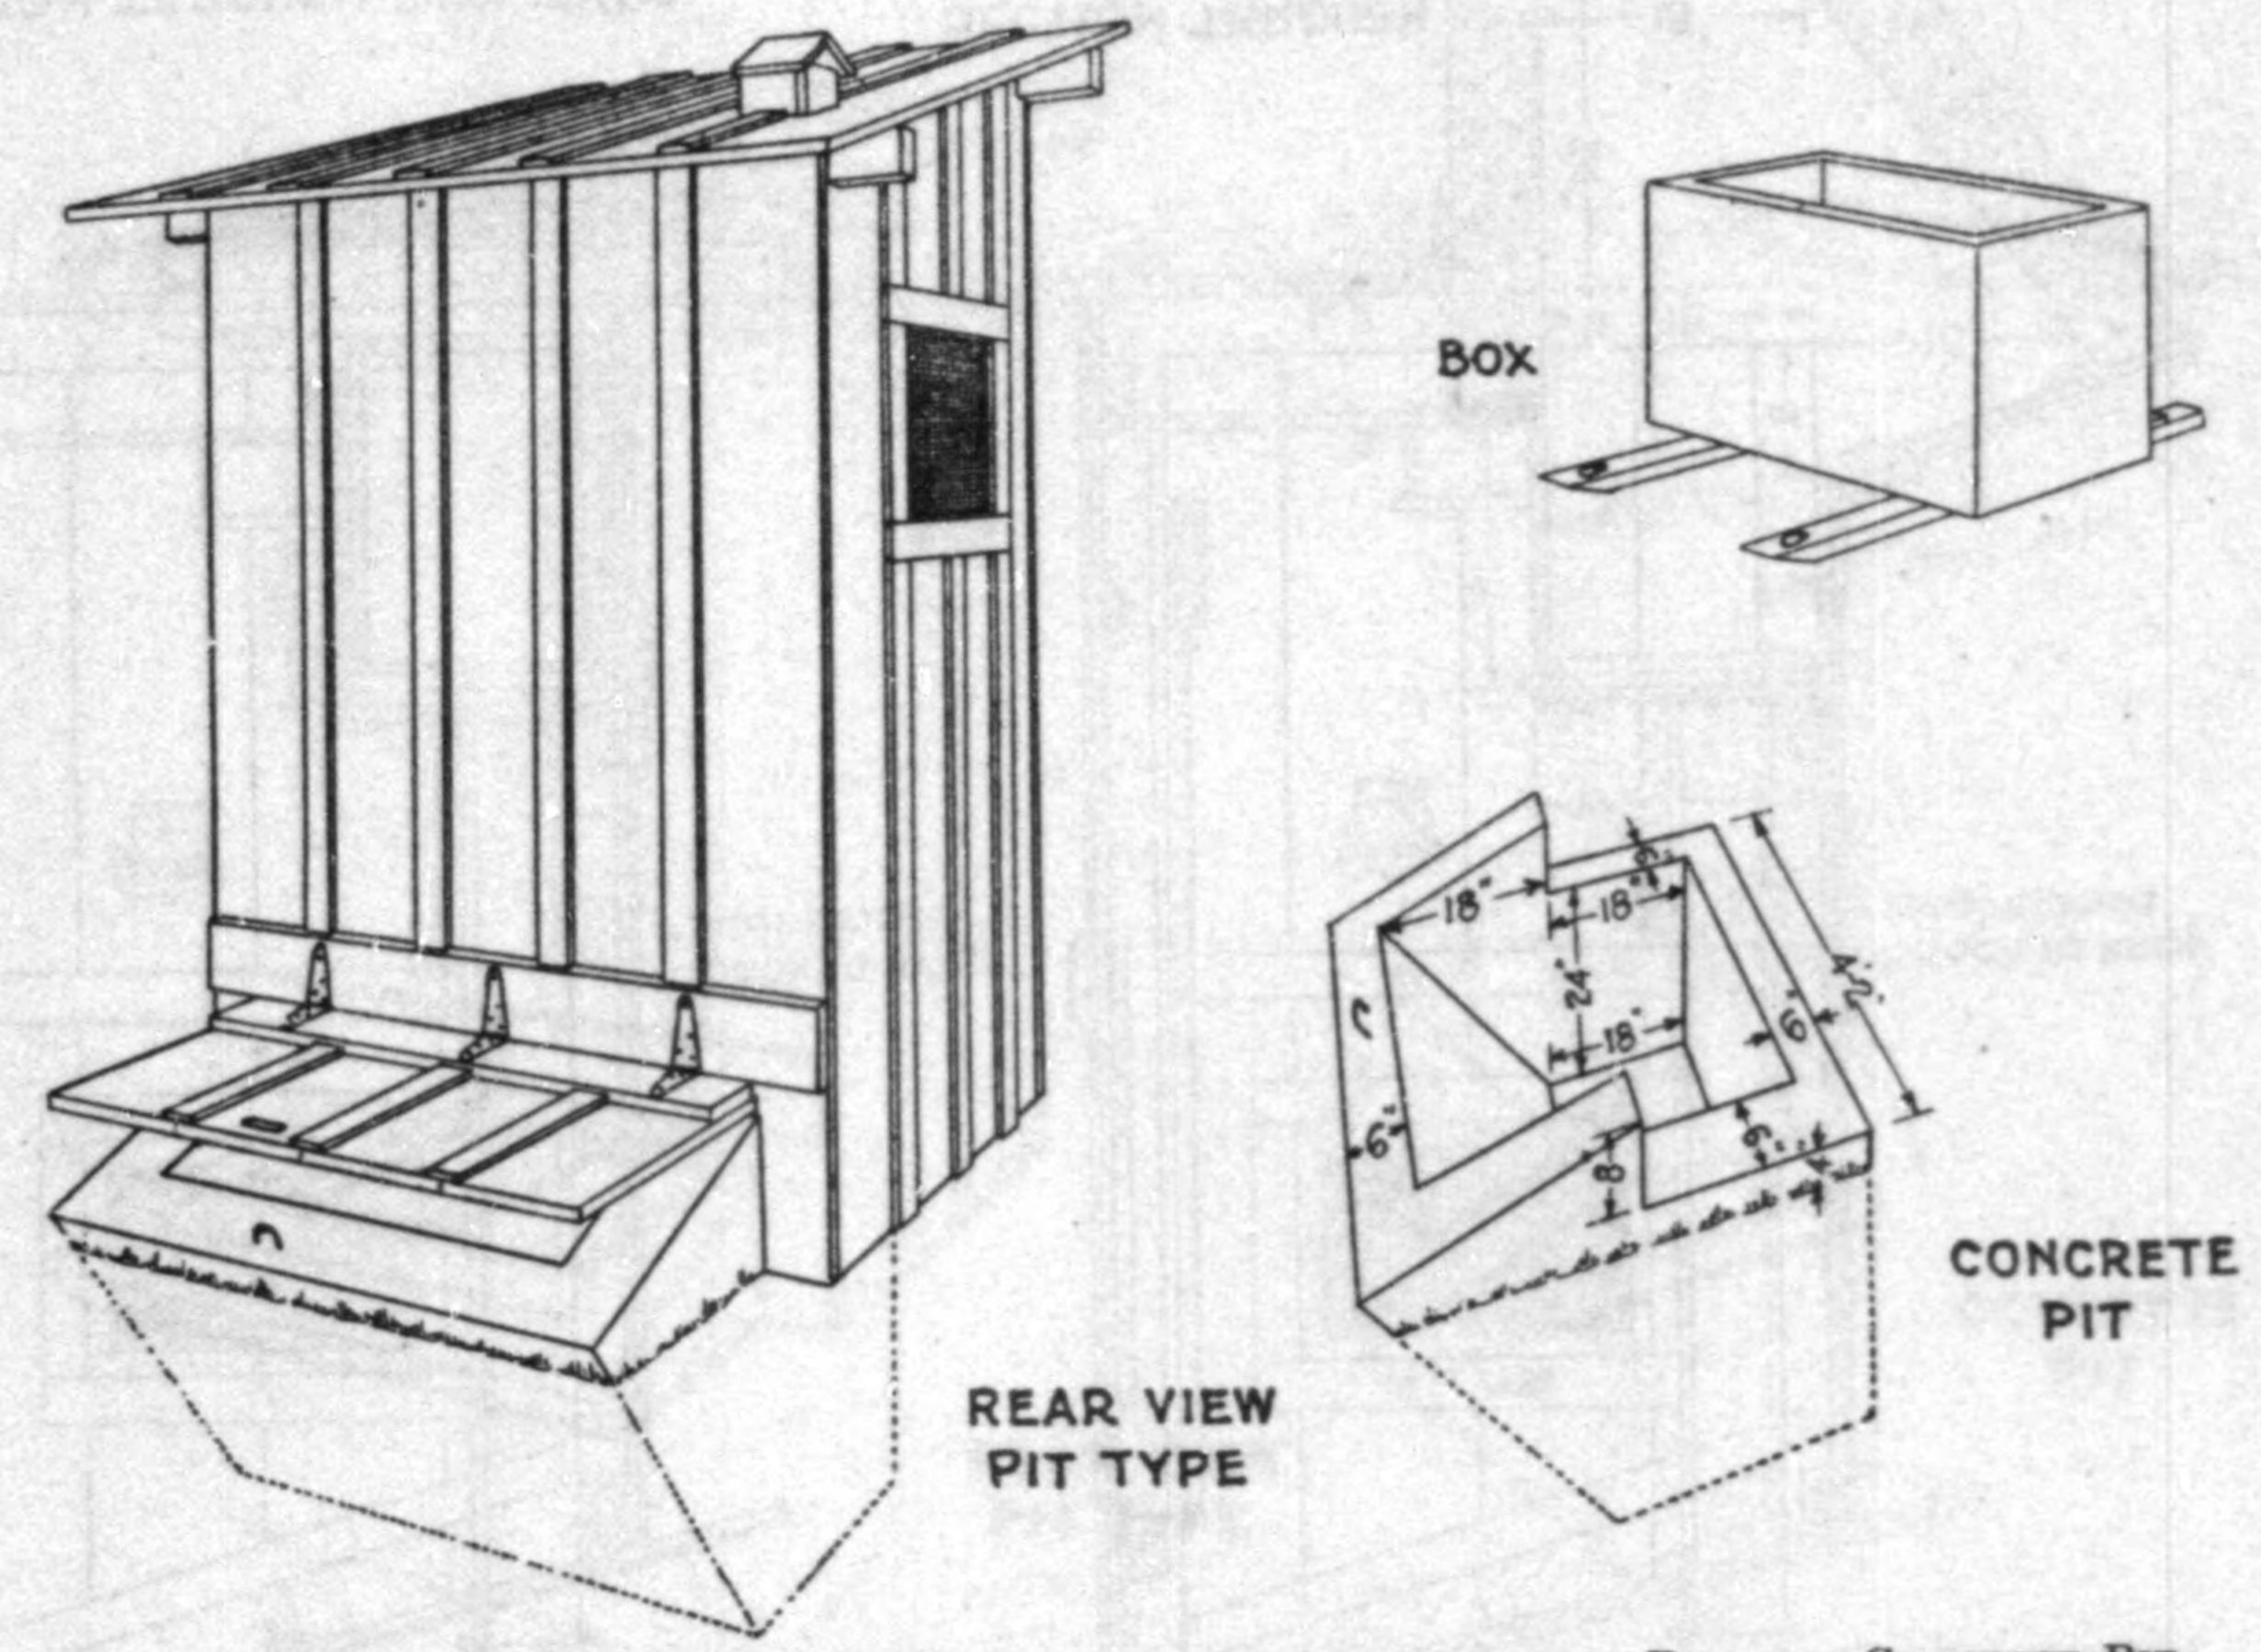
CROSS SECTIONS OF BOX AND CONCRETE PIT TYPES.
